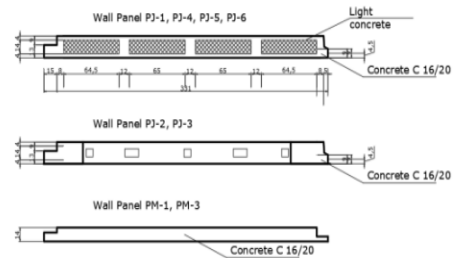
Section of the prefabricated panels, Manhattan Street building, Kamez, Tirana, Albania [44].
